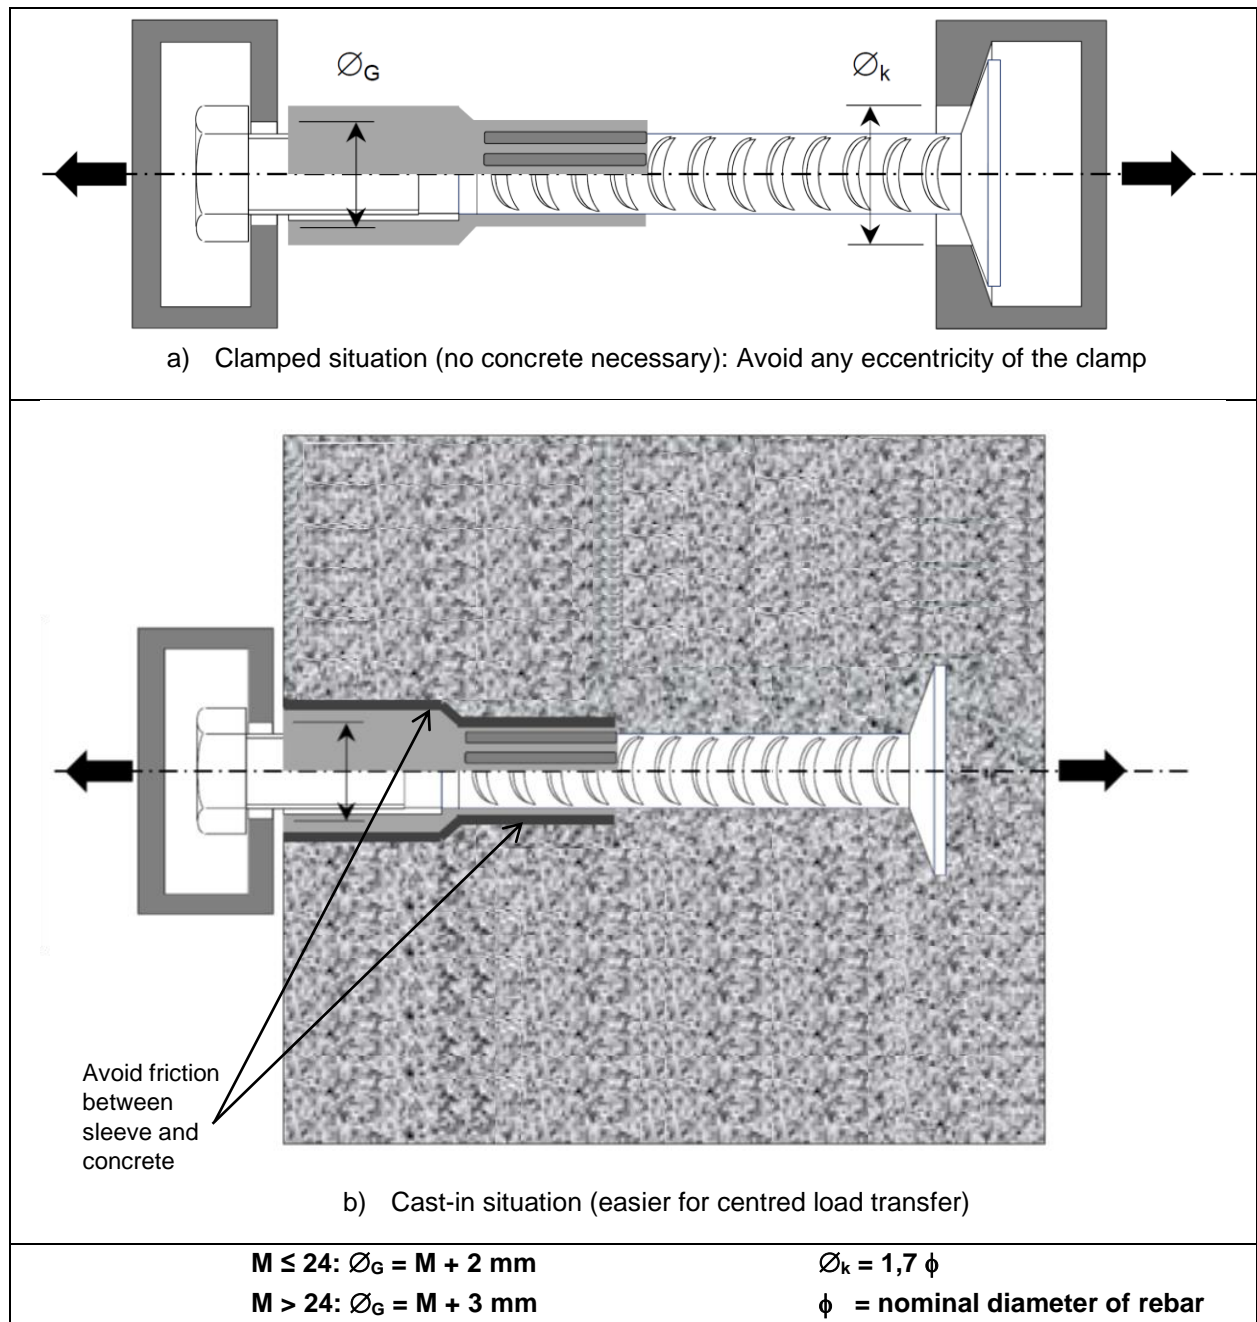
Examples for test setup in tests for steel failure
